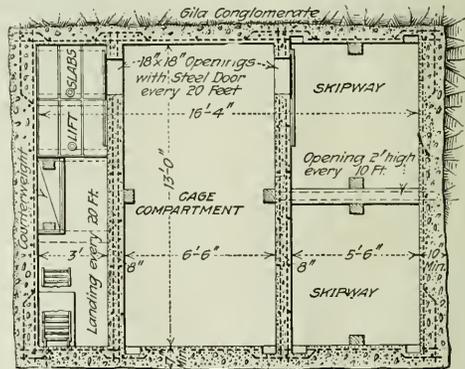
CROSS-SECTION OF SHAFT, SHOWING CONCRETE LINING
